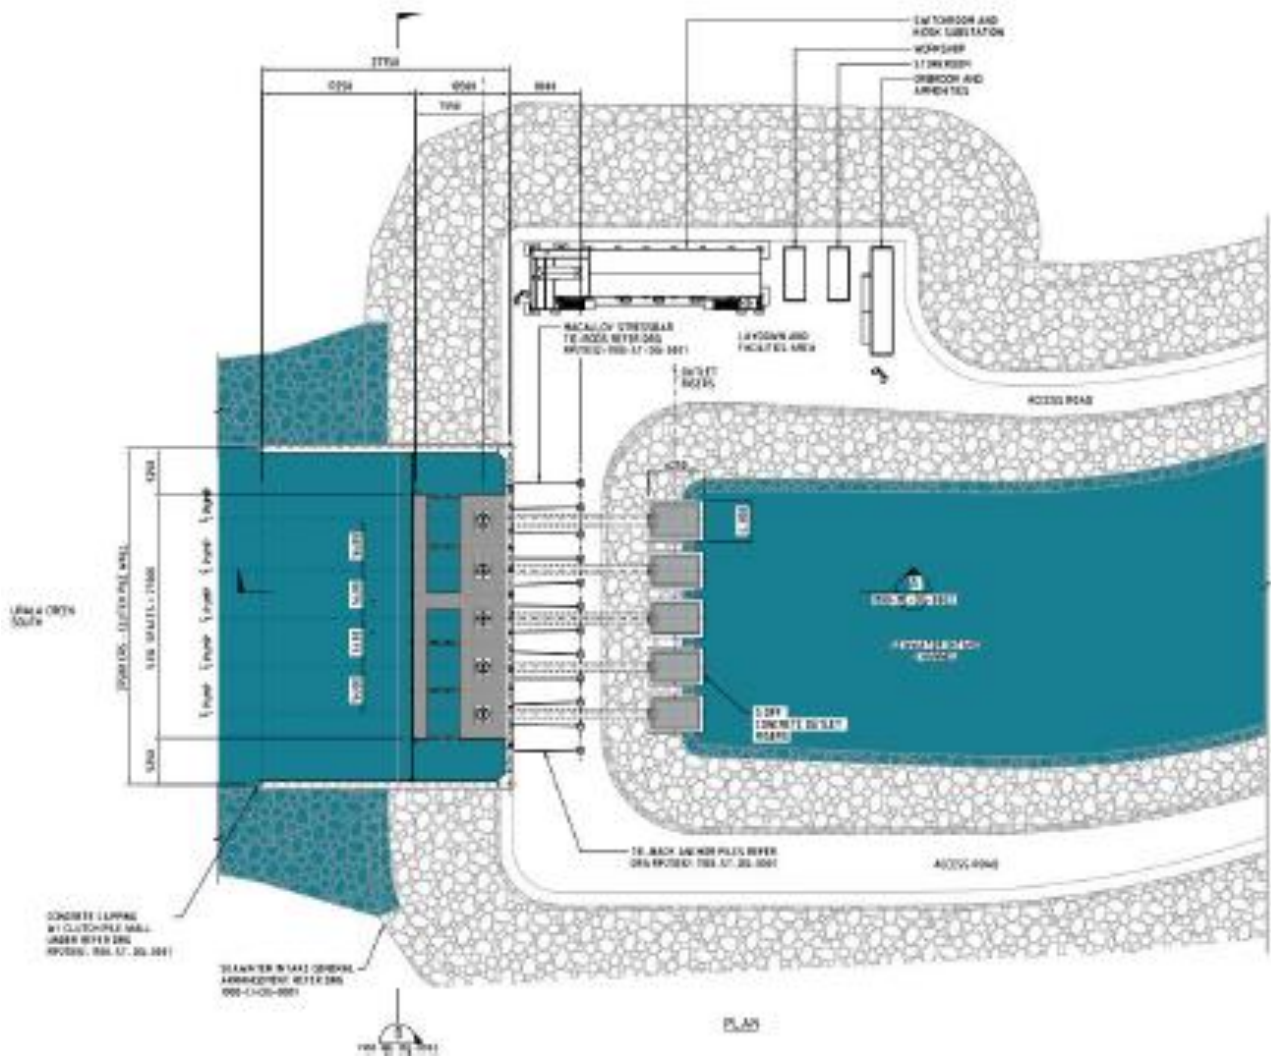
Sea Water Intake, Pump Station (PS-01) and Intake Channel – Plan Arrangement
